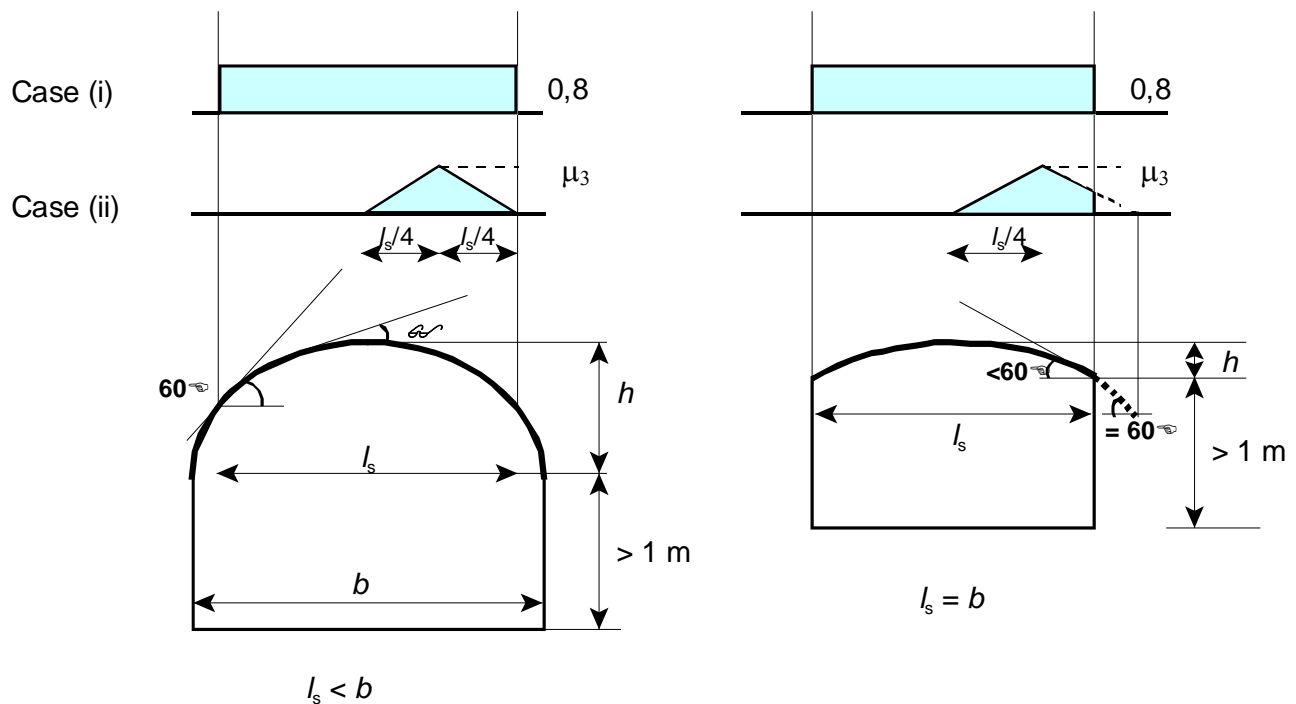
(FI): Snow load shape coefficients for cylindrical roof
